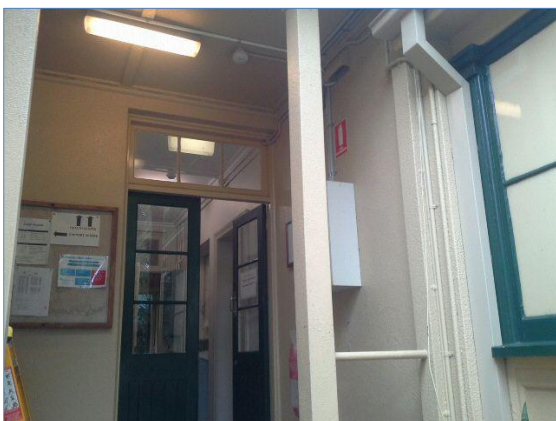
Ground floor corridor 2.13 - Asbestos cement ceiling lining
